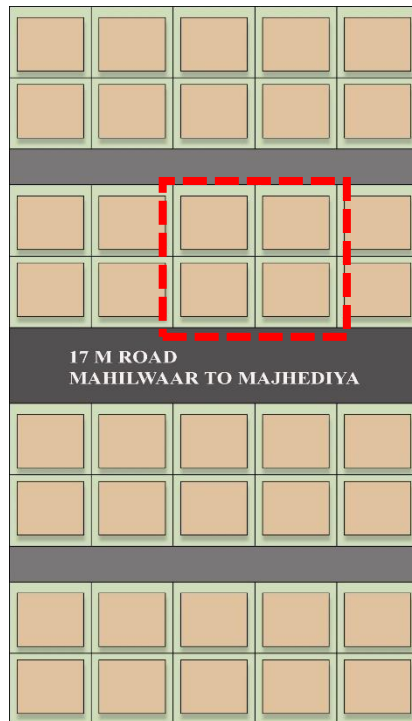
18 Building arrangement for setback of 1.5m and 2.5m
